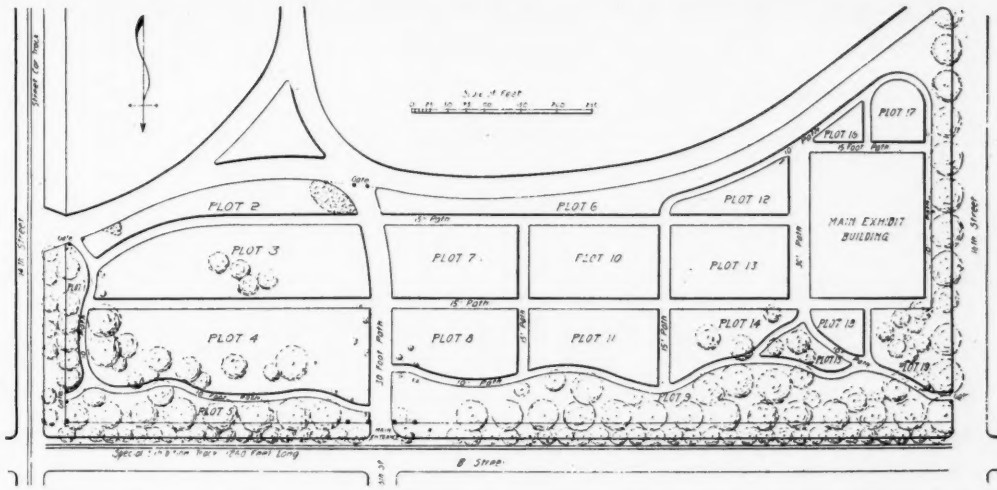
GROUND PLAN AMERICAN RAILWAY APPLIANCE EXPOSITION, WASHINGTON, D. C.
